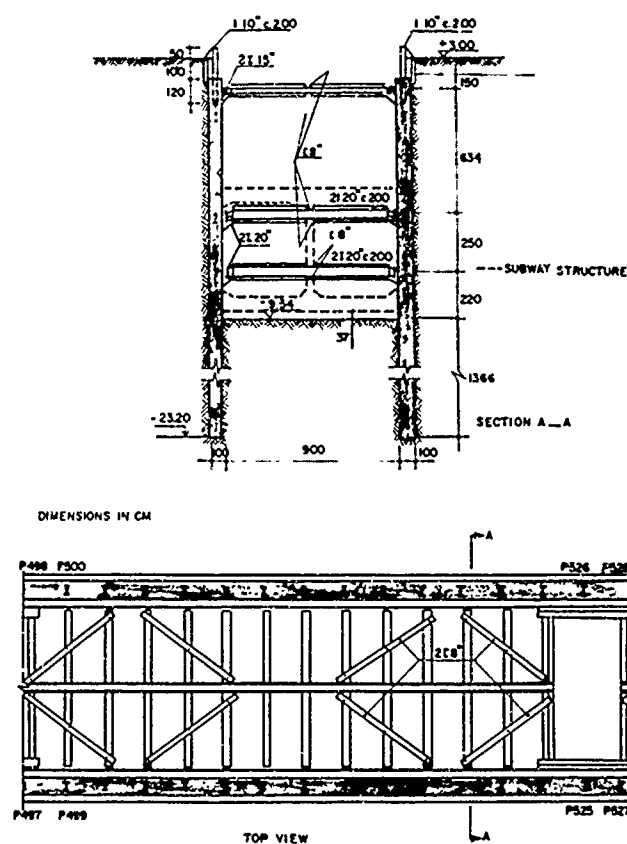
Rio de Janeiro Subway Retaining Structure at Catete Street
